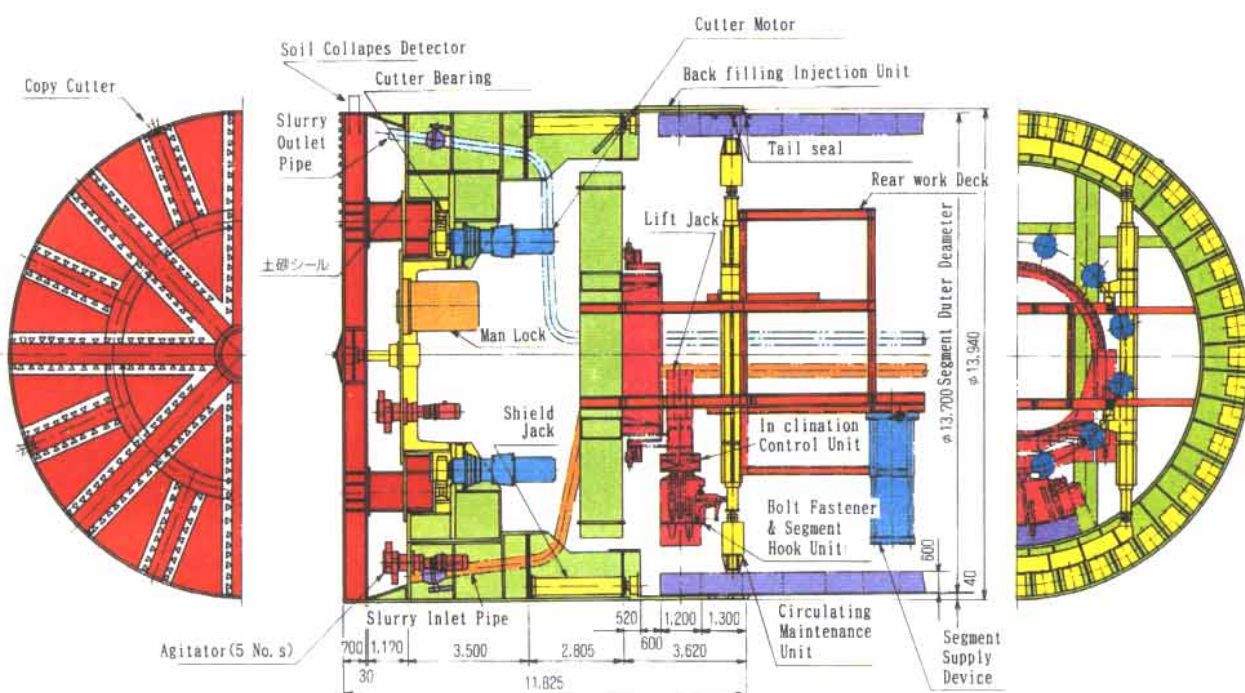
TBM of Underground River beneath Loop Road No. 7
